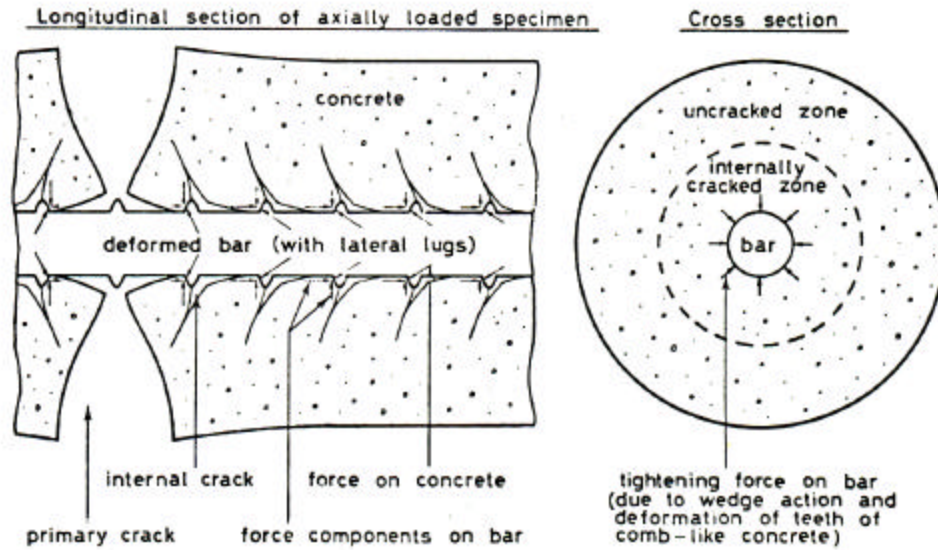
Internal Cracks Around Steel Deformed Bars (From Goto, 1971)
